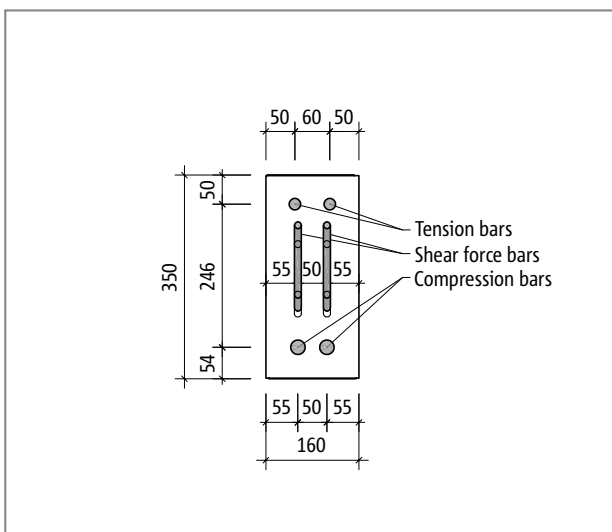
Schöck Isokorb® T type B-M1-V1 for R0: Product layout
